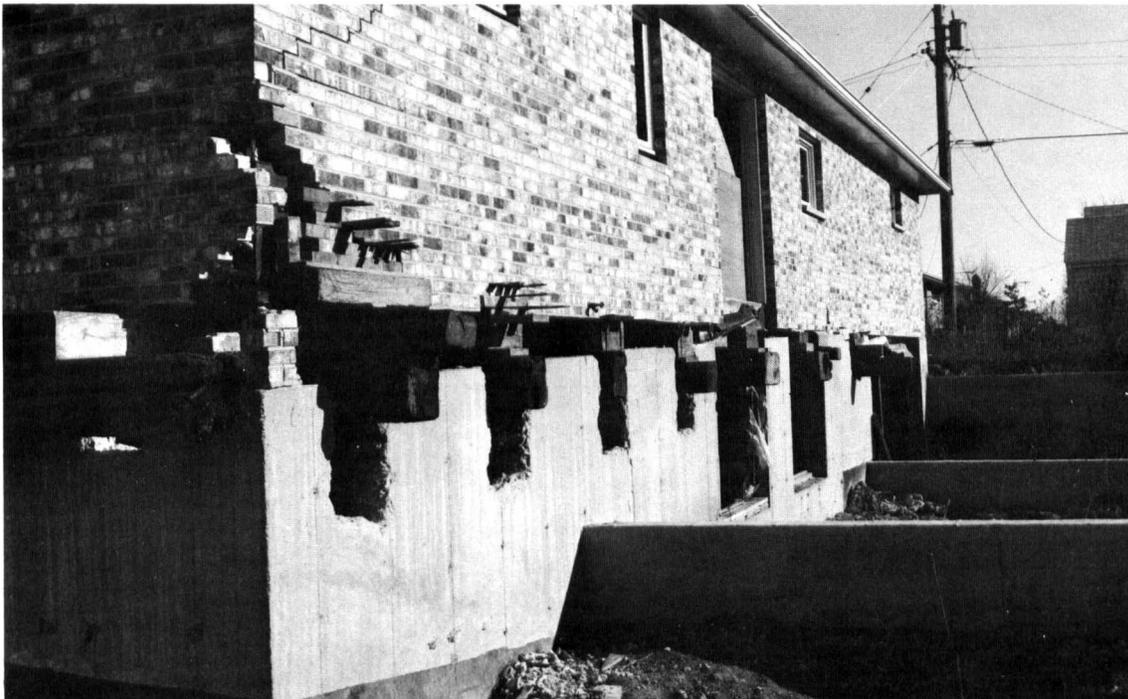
Failure of house foundation and consequent cracking of wall of house.
